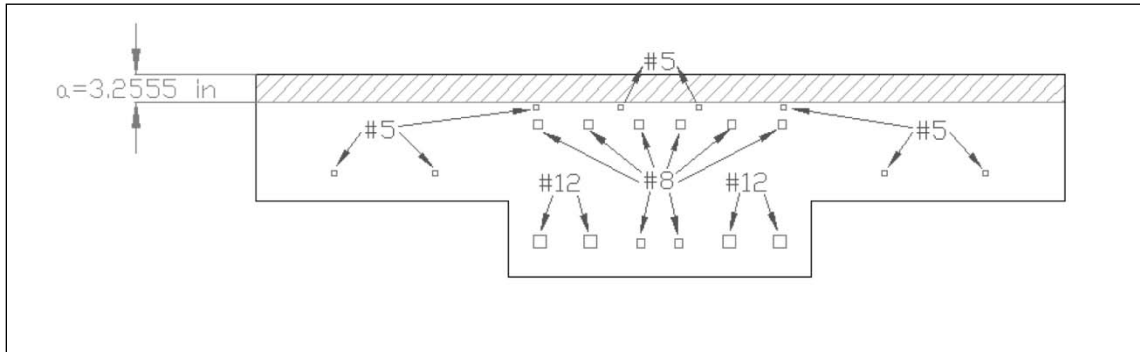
Cross section of the interior beam at mid-span showing the compression zone.
